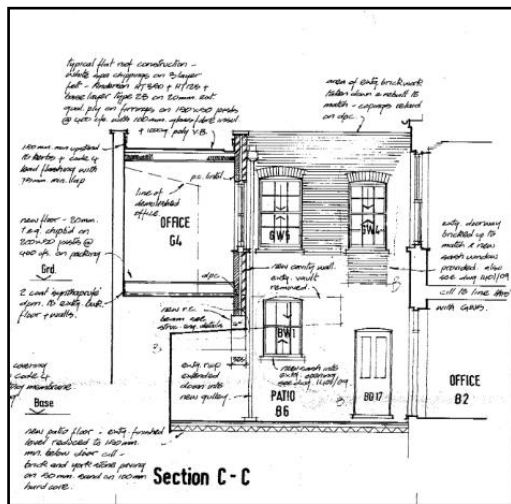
Section drawing from the 1985 planning application showing the extent of rebuilt brickwork and modifications to window and door openings to the side of the existing part width rear addition.
